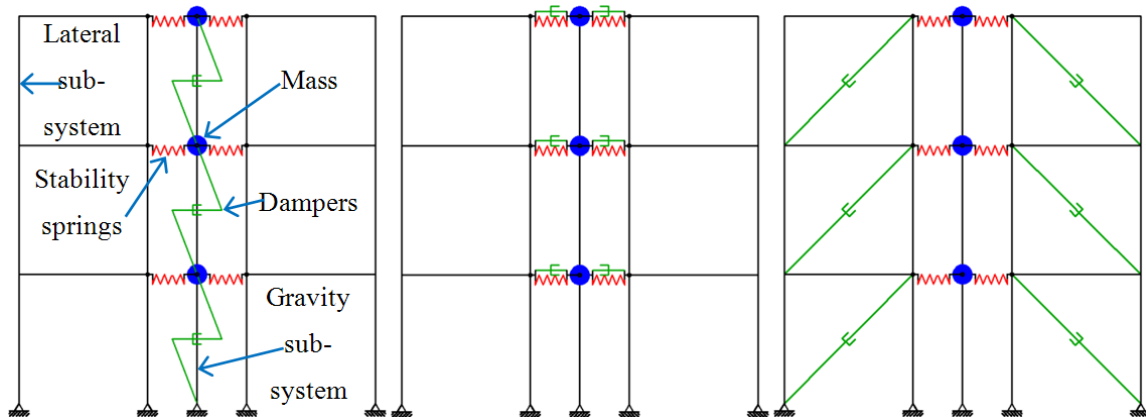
SDMI building prototype with a) dampers in the gravity sub-system, b) dampers joining the gravity and lateral sub-systems, and c) dampers in the lateral sub-system
